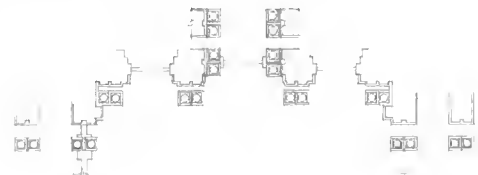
Plan drawn from Pozzo's Preliminary Drawing. (Author).
